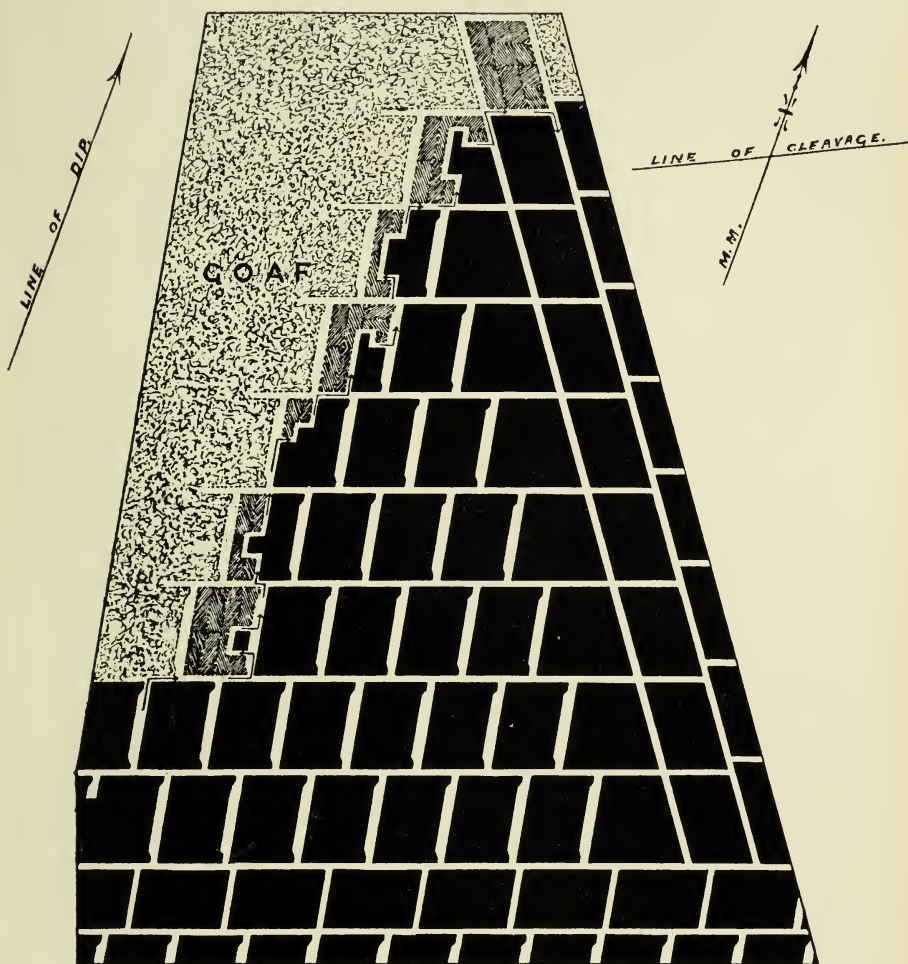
ALLANSHAW COLLIERY, HAMILTON, SCOTLAND. PLAN SHOWING PILLAR AND STALL METHOD OF WORKING THE ELL COAL SEAM.
